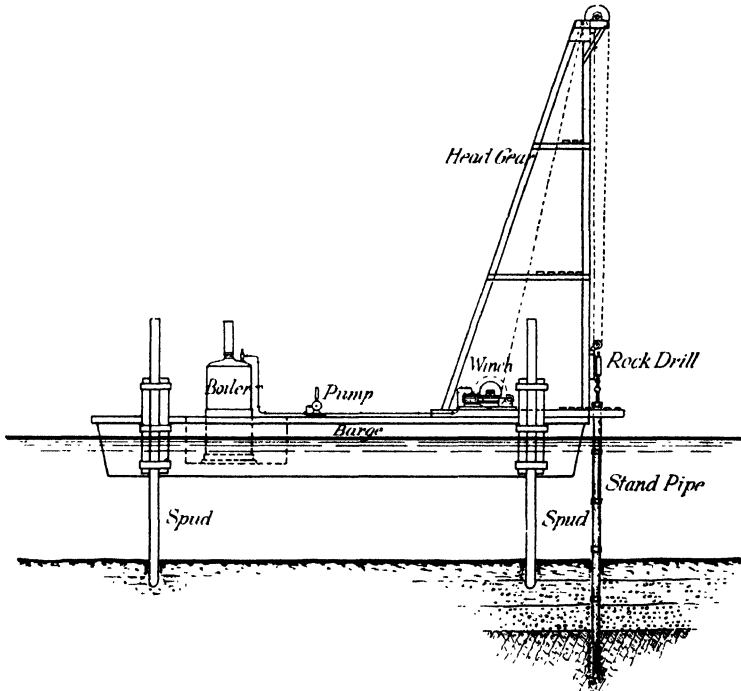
Spud Boring Barge, with Rock Drill, Side Elevation.
